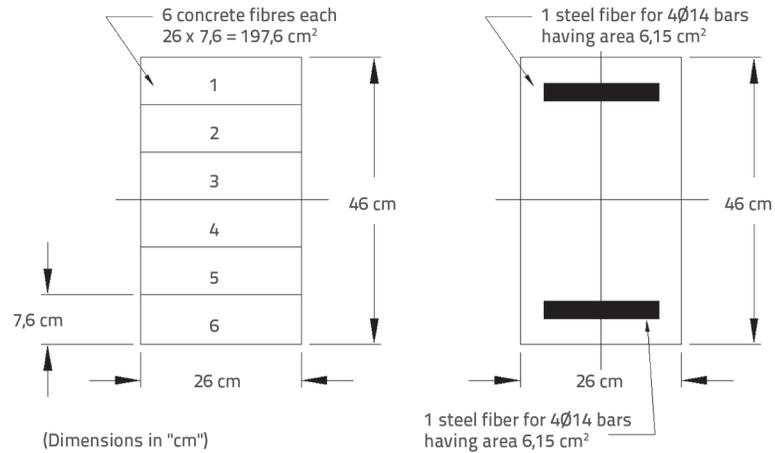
Beam cross-section composed of 6 concrete fibres (left) and 2 steel fibres (right)
